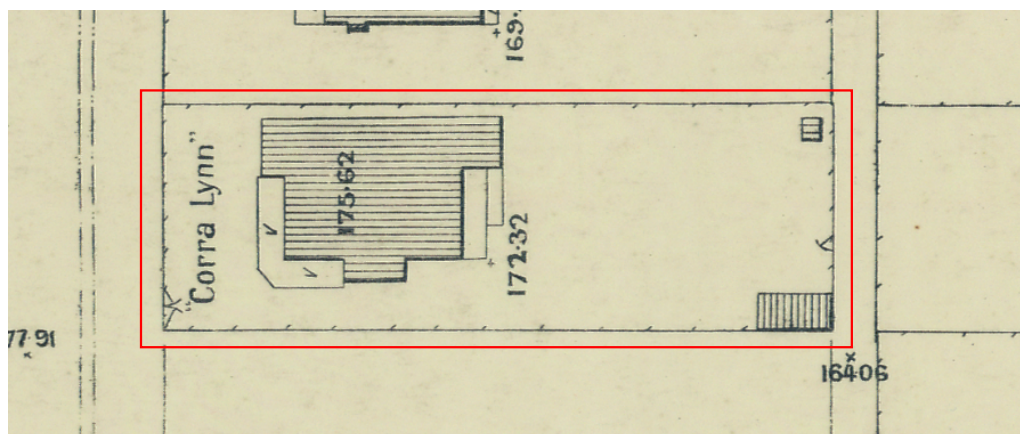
Detail from Melbourne and Metropolitan Board of Works detail plan No. 2954, Municipality of Camberwell, 1926. (Source: State Library Victoria, with GML overlay)
